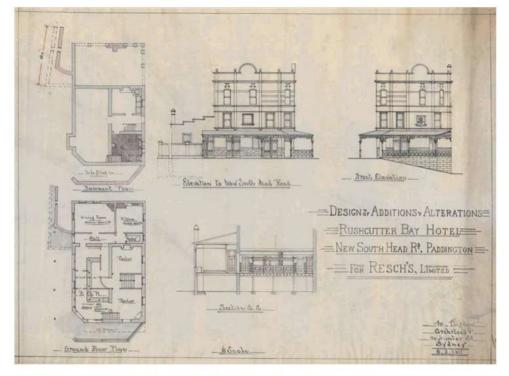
"Rushcutter [sic] Bay Hotel, New South Head Road, Paddington, Design of additions and alterations, basement and ground floor plan, front elevation, elevation to New South Head Road and section, Applicant/owner, Reschs Limited, Architect M Rigden, 70 Hunter Street, Sydney, Signed 30 March 1911". accessed via State Archives & Records https://www.records.nsw.gov.au/image/9590 62949
